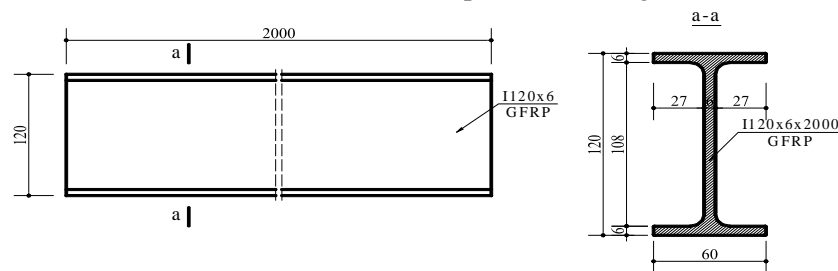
Specimens geometry for S1 series (dimensions in mm).
